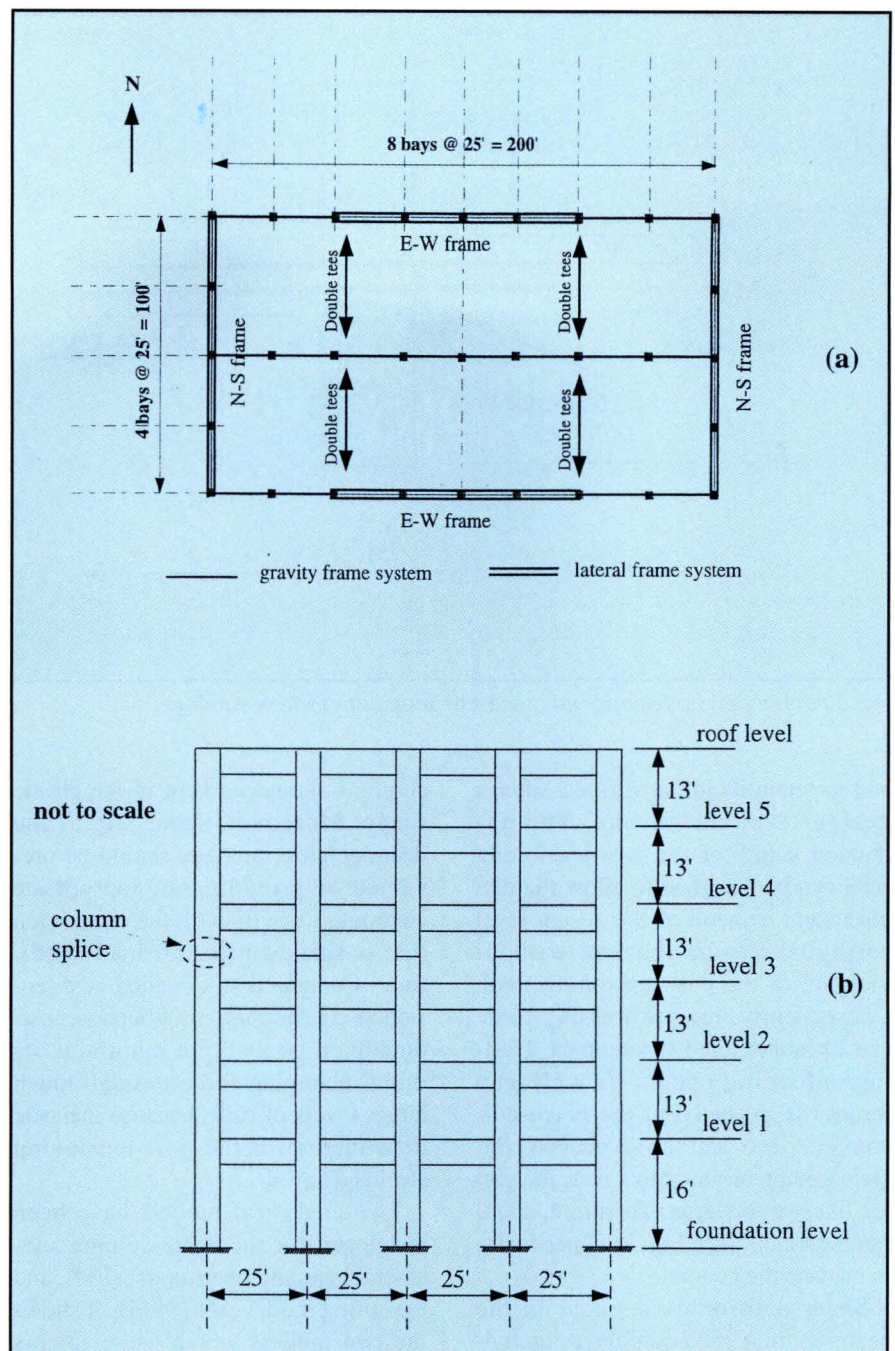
Prototype frames: (a) layout of prototype building; (b) elevation view of prototype frames. Note: 1 ft = 305 mm.
